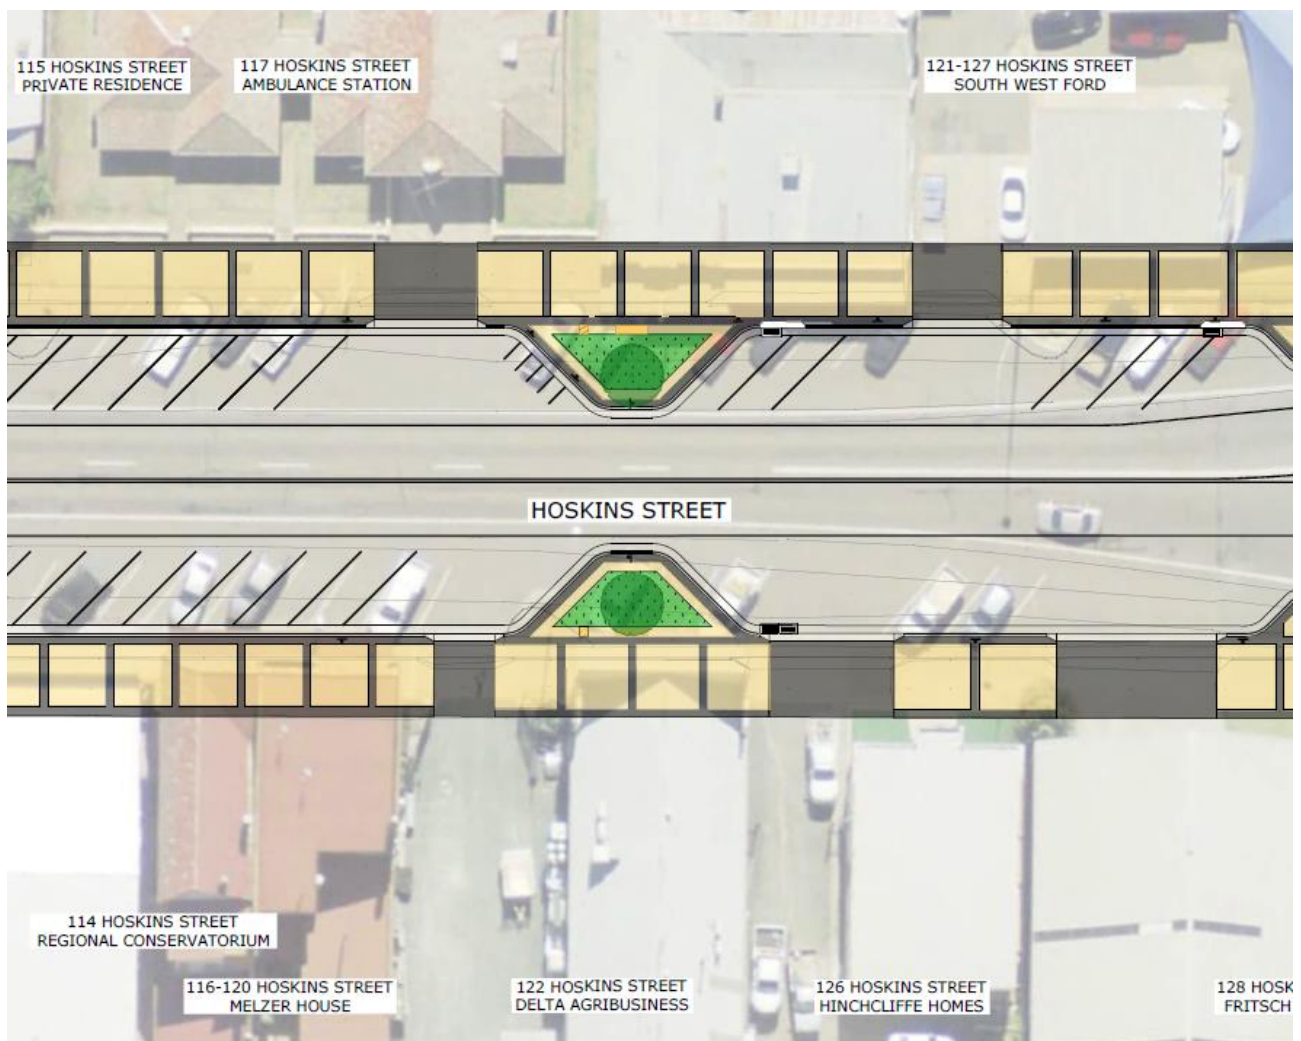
Extract of exhibition plan showing indicative parking separation from carriageway
